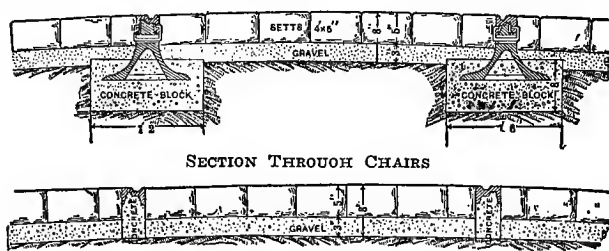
EARLY USE OF STEEL YOKES ON RAIL ANCHORS IN CONCRETE IN BRISTOL, ENGLAND
